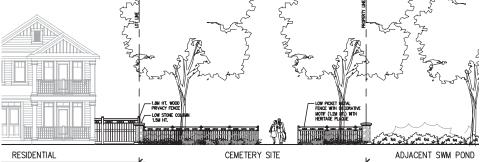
Harrison Hewgill Cemetery Concept Elevation
